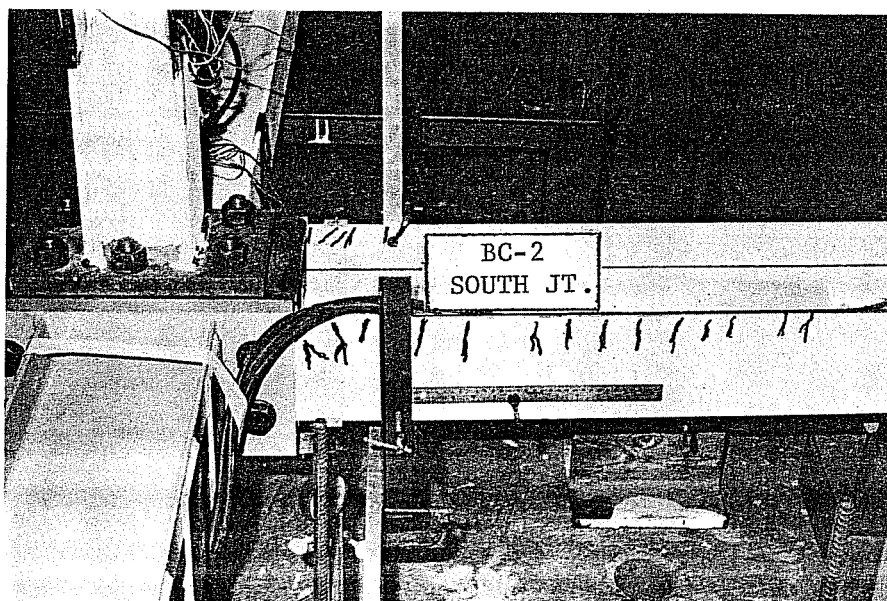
Yielded zone at south joint after failure, Specimen BC-2
